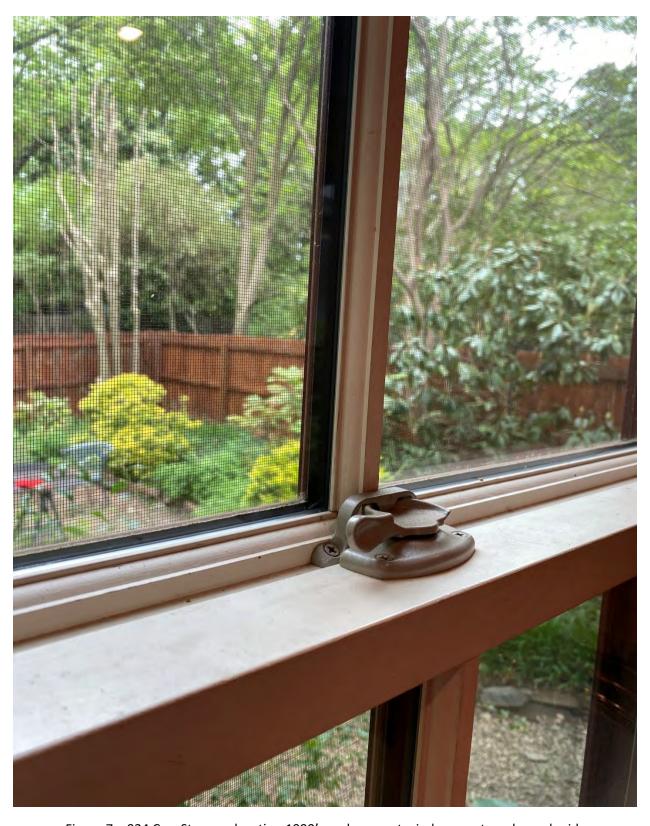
924 Carr St. rear elevation 1990's replacement window – external wood grids
